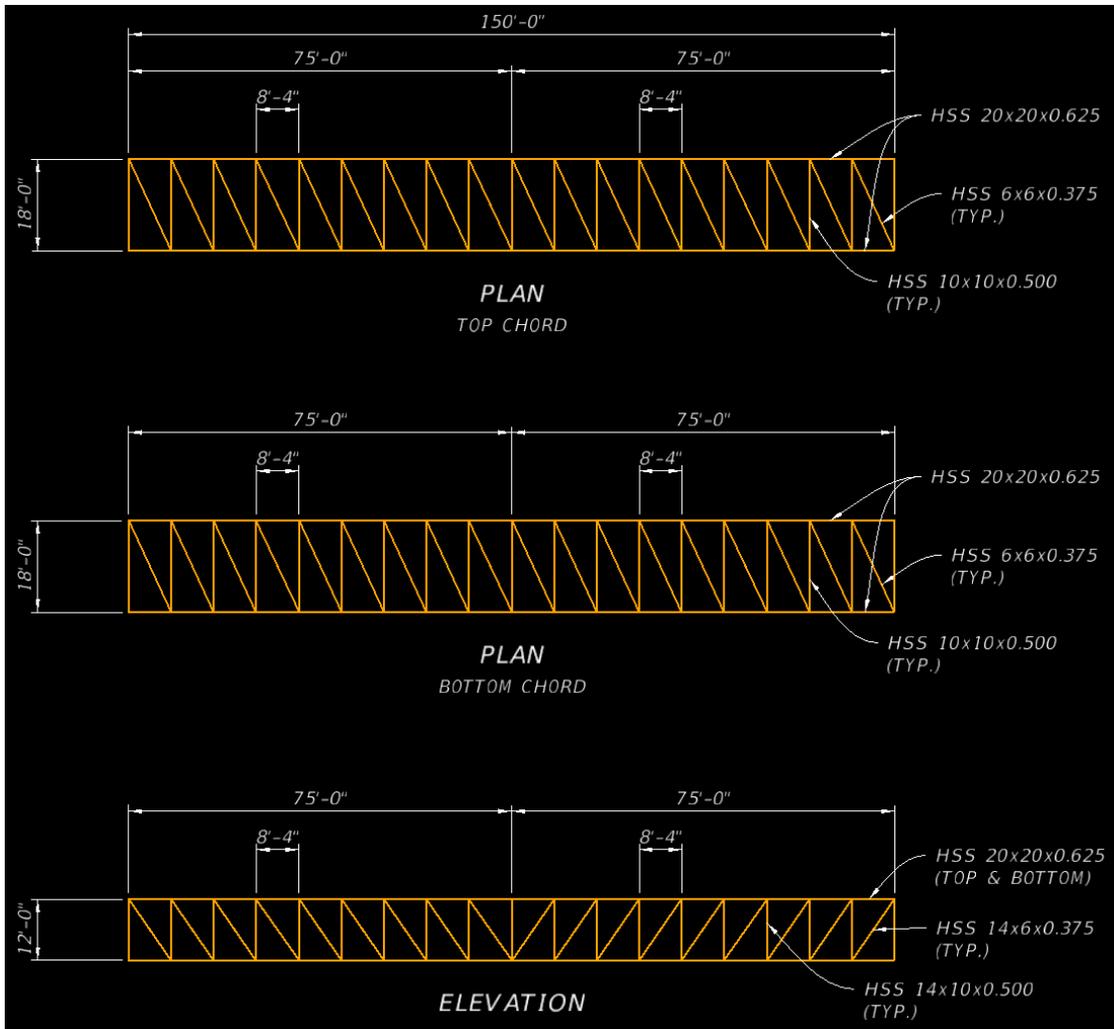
Granada Blvd Concept Drawing, Truss Plan and Elevation
